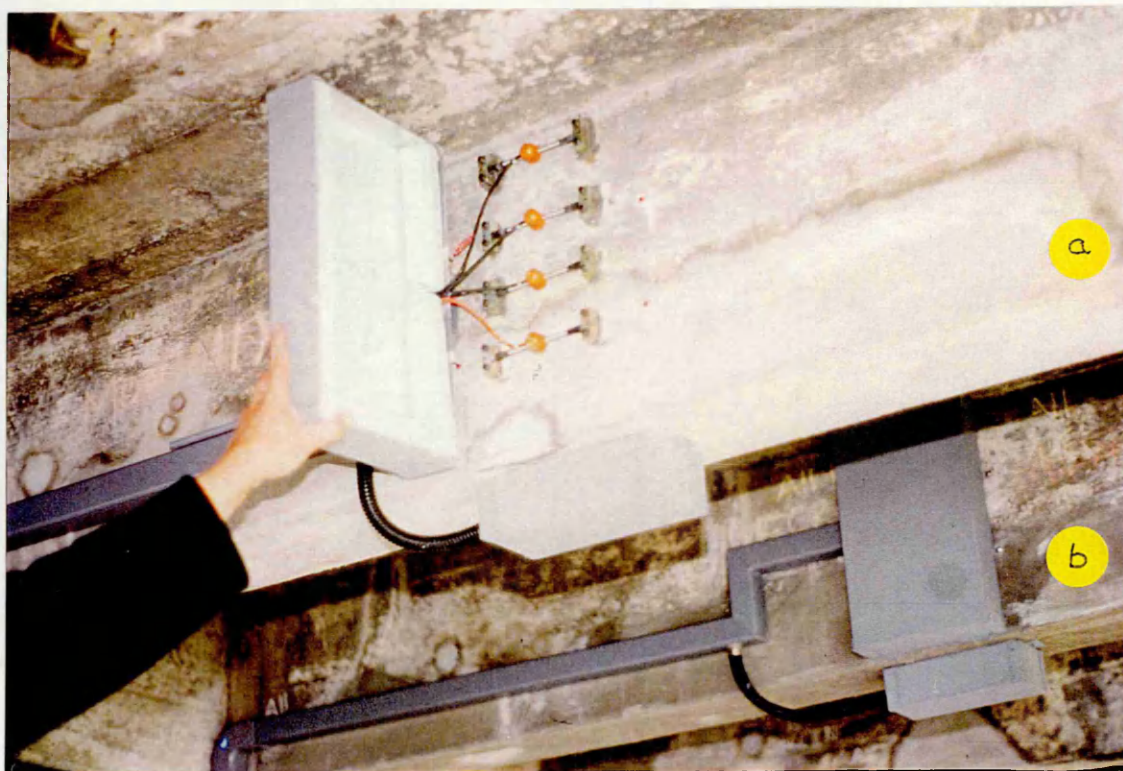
View of completed repairs to lateral beams, monitoring equipment and protective covers: (a) material G5, (b) material G4
